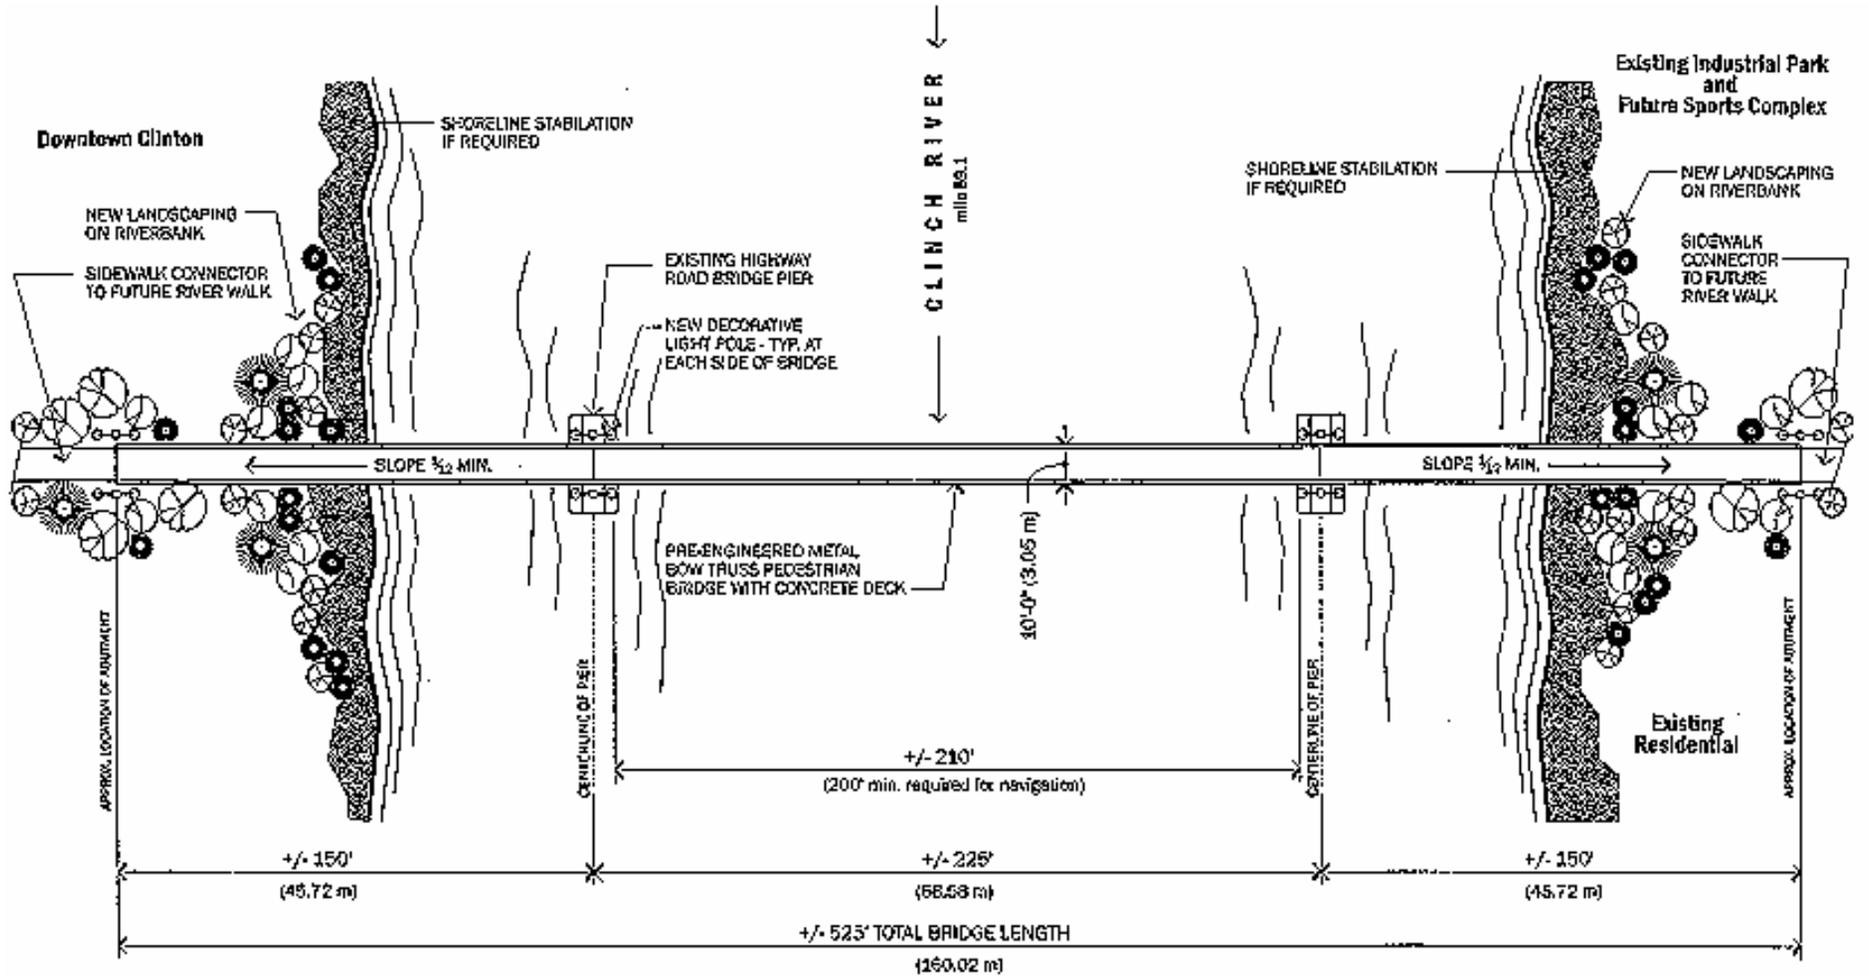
City of Clinton, Carden Farm Sports Complex and Riverwalk – Clinch River Pedestrian Bridge Site Plan
